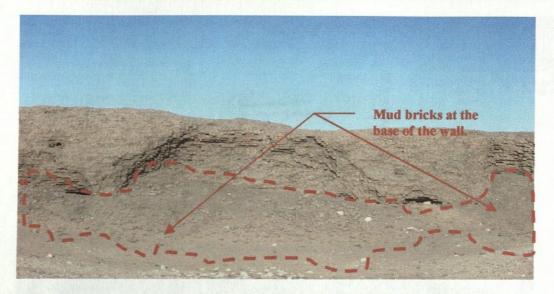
Center portion of the east elevation of the east wall showing a large accumulation of mud bricks on the surface of the ground.
